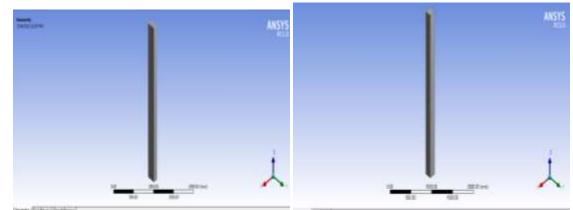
Geometry of Rectangular control and FRP jacketed RC column.
